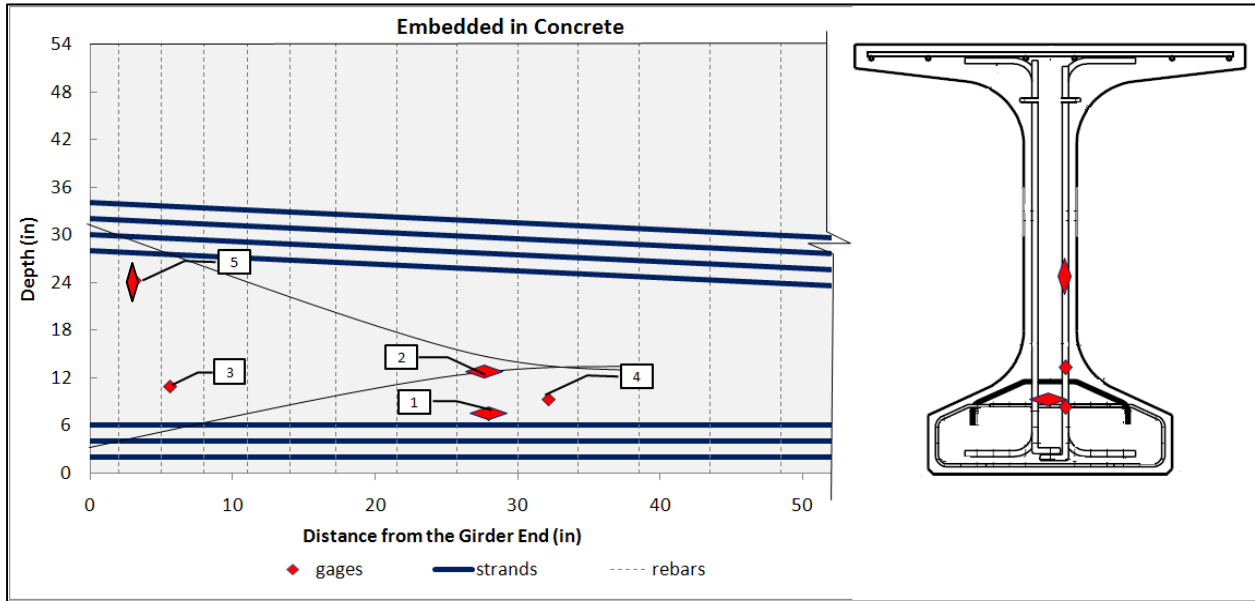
Locations of embedded strain gages in concrete shown on elevation view (left) and cross section view (right).
